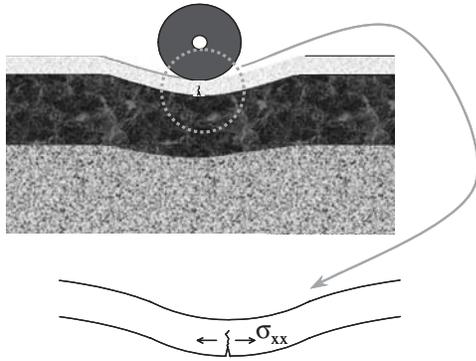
Mid-slab cracking mechanism in a UTW slab.
